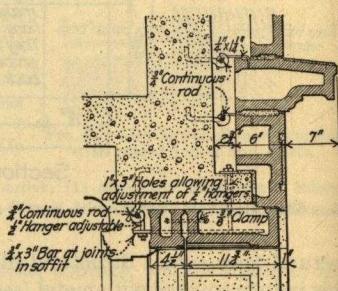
Section through paneled soffit and cornice serving as lintel.
